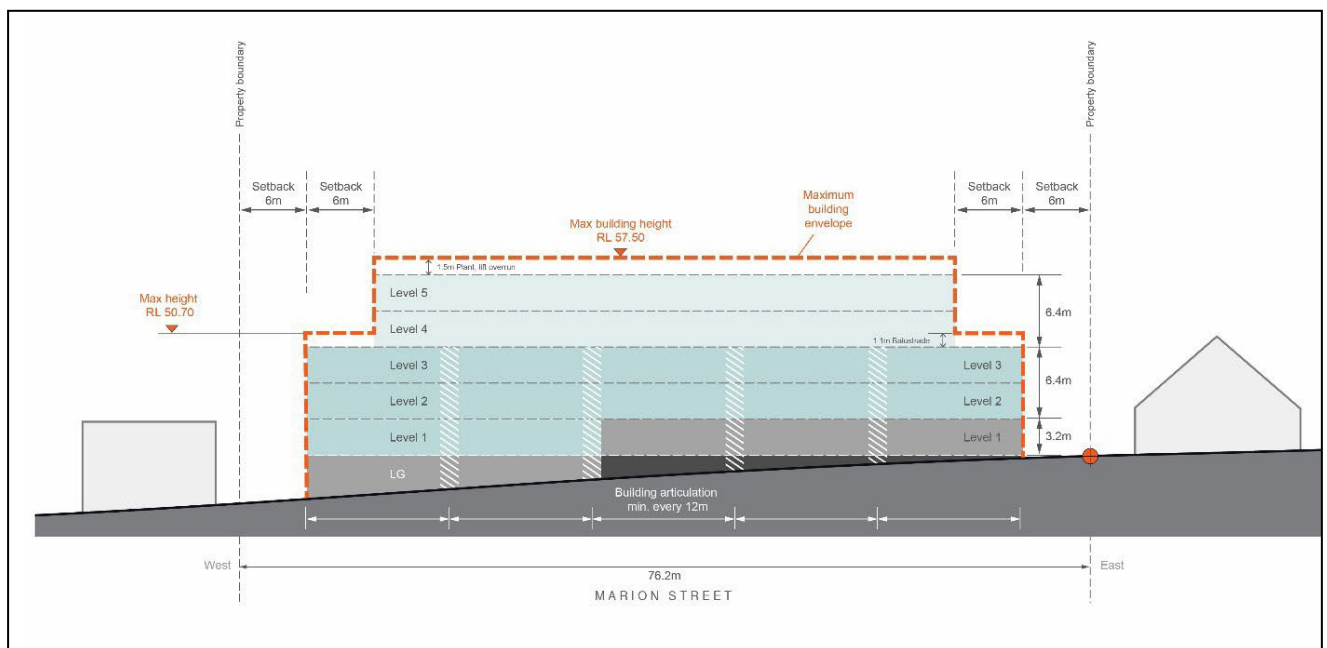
Building Heights and Massing Envelope – Section B (east-west)
